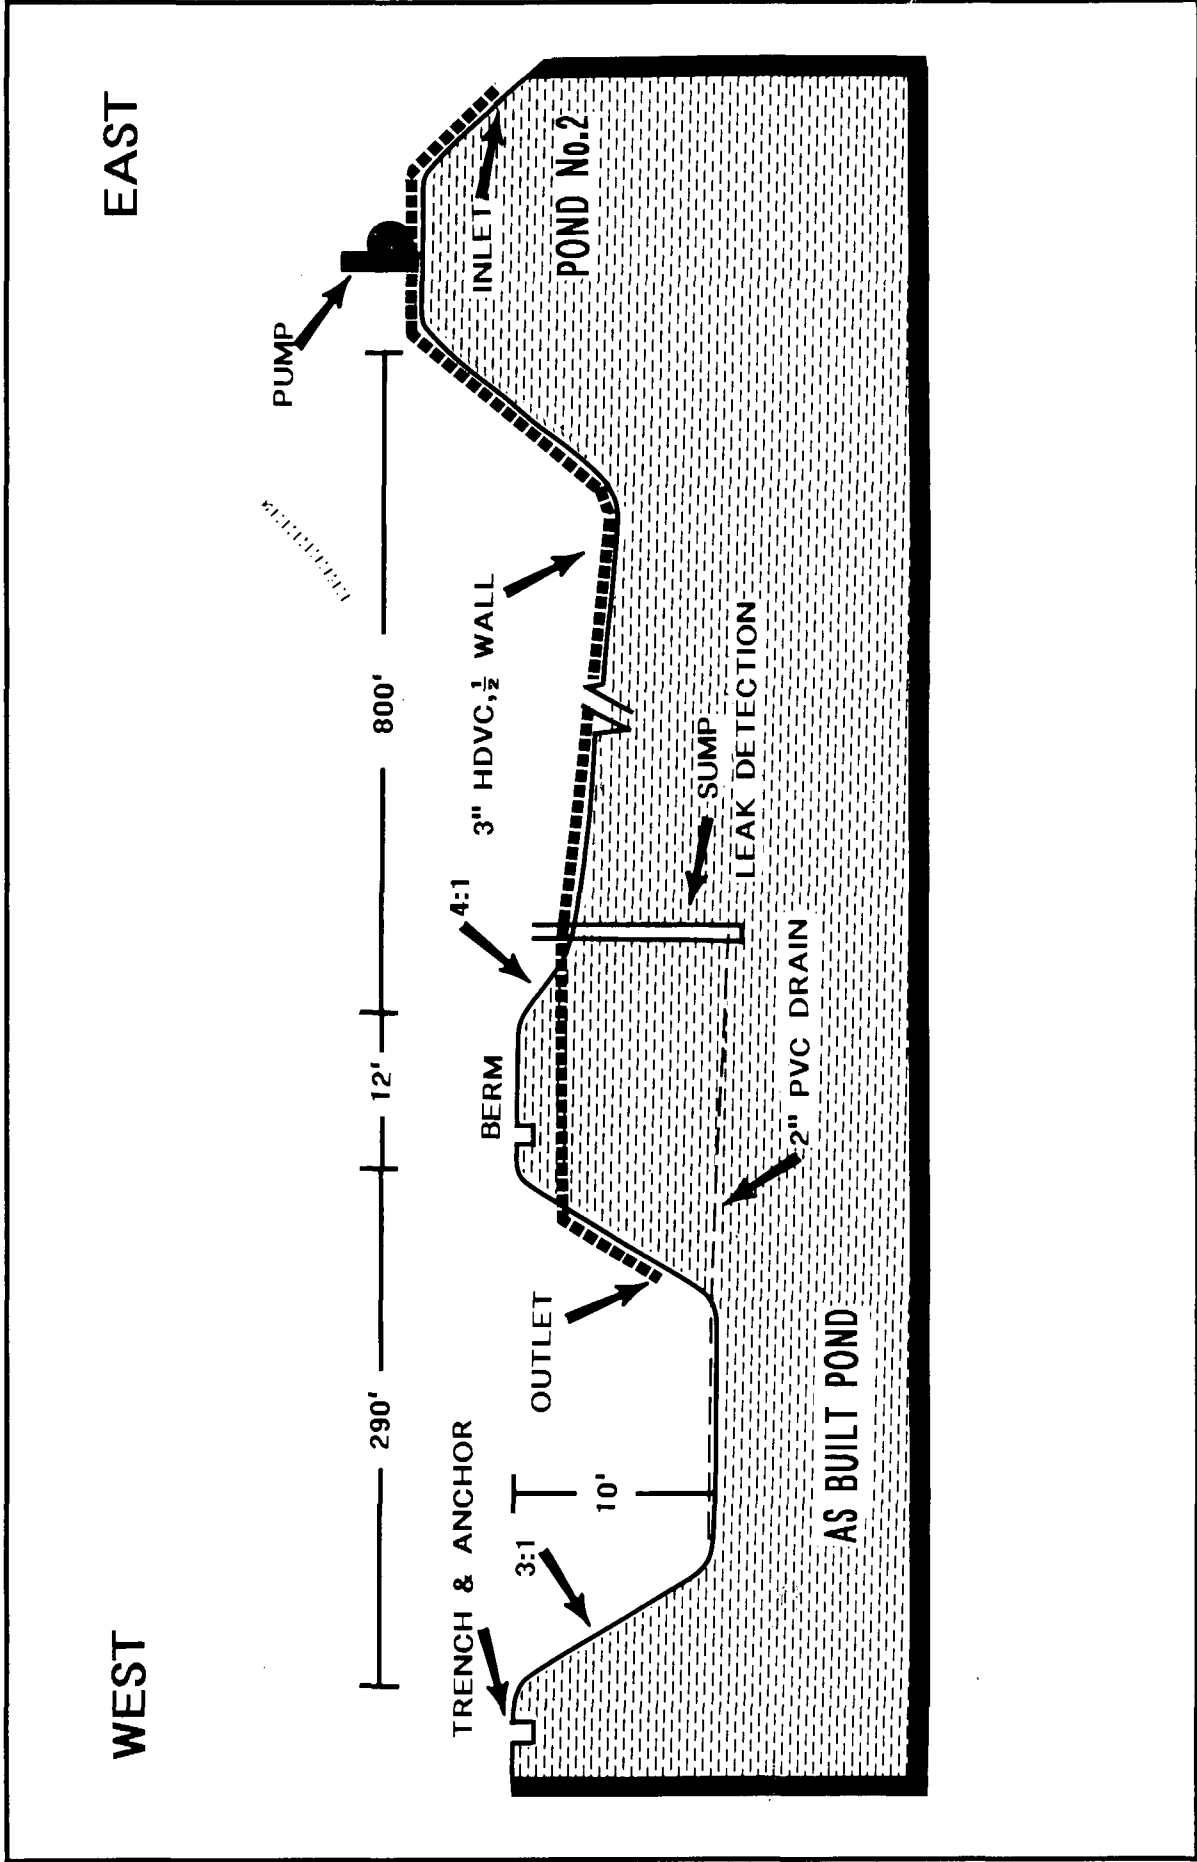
Generalized cross-section showing some of the dimensions of the AS BUILT waste pond, details and transfer system of waste water from an existing waste pond (PIT No. 2) to the East some 800 feet.
